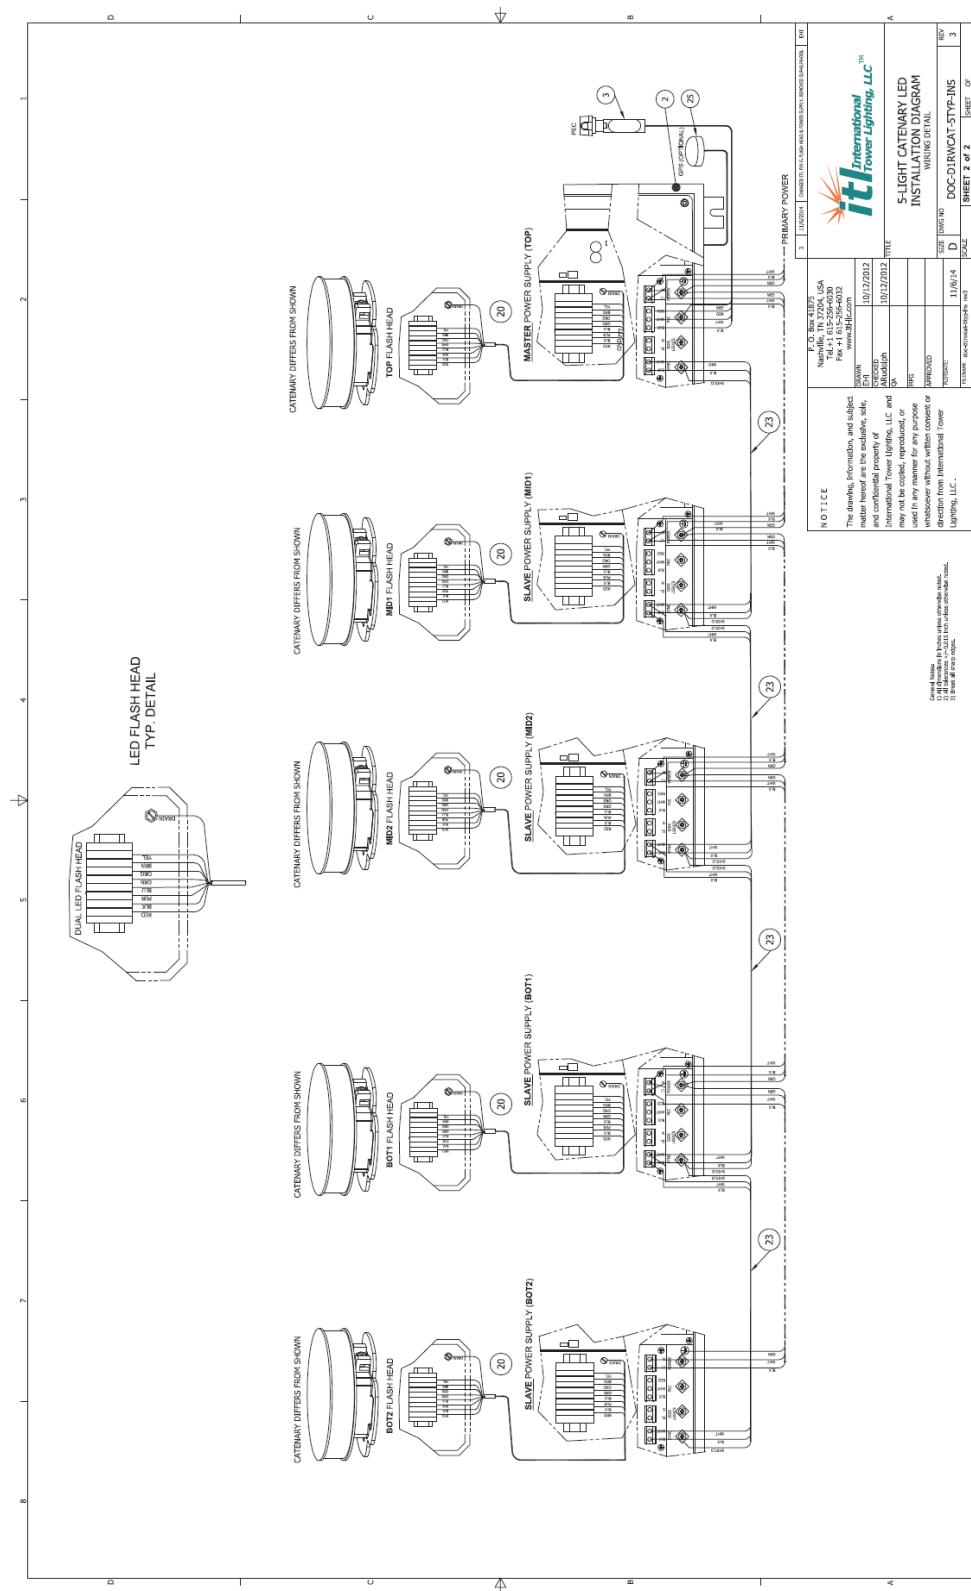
5-LED Catenary System Typical Installation Diagram Wiring Detail
